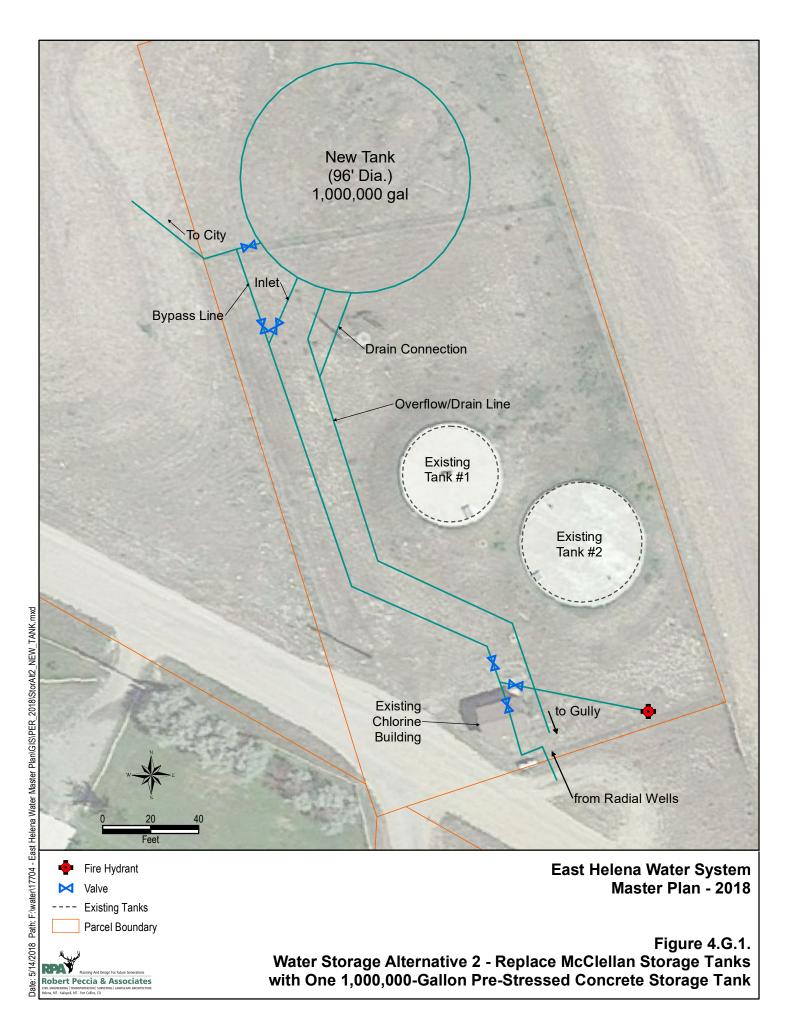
G.1 shows the new 1,000,000-gallon pre-stressed concrete storage tank location.
